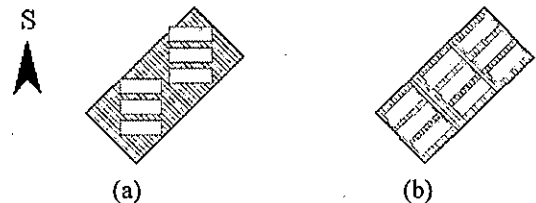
PV panels are arranged in (a) aligned to north-south line; (b) parallel to roof corrugating lines.
